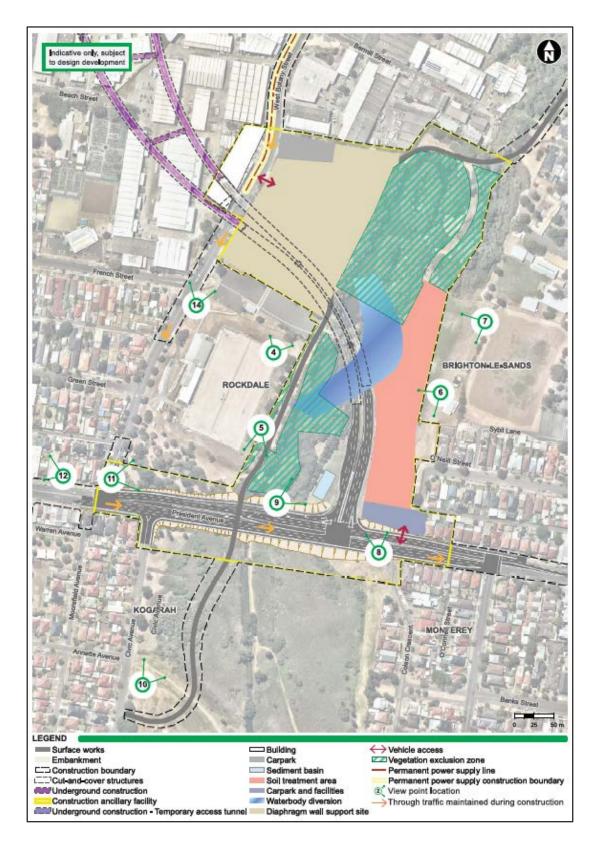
| Construction layout and viewpoints, southern surface works (Source: EIS)
